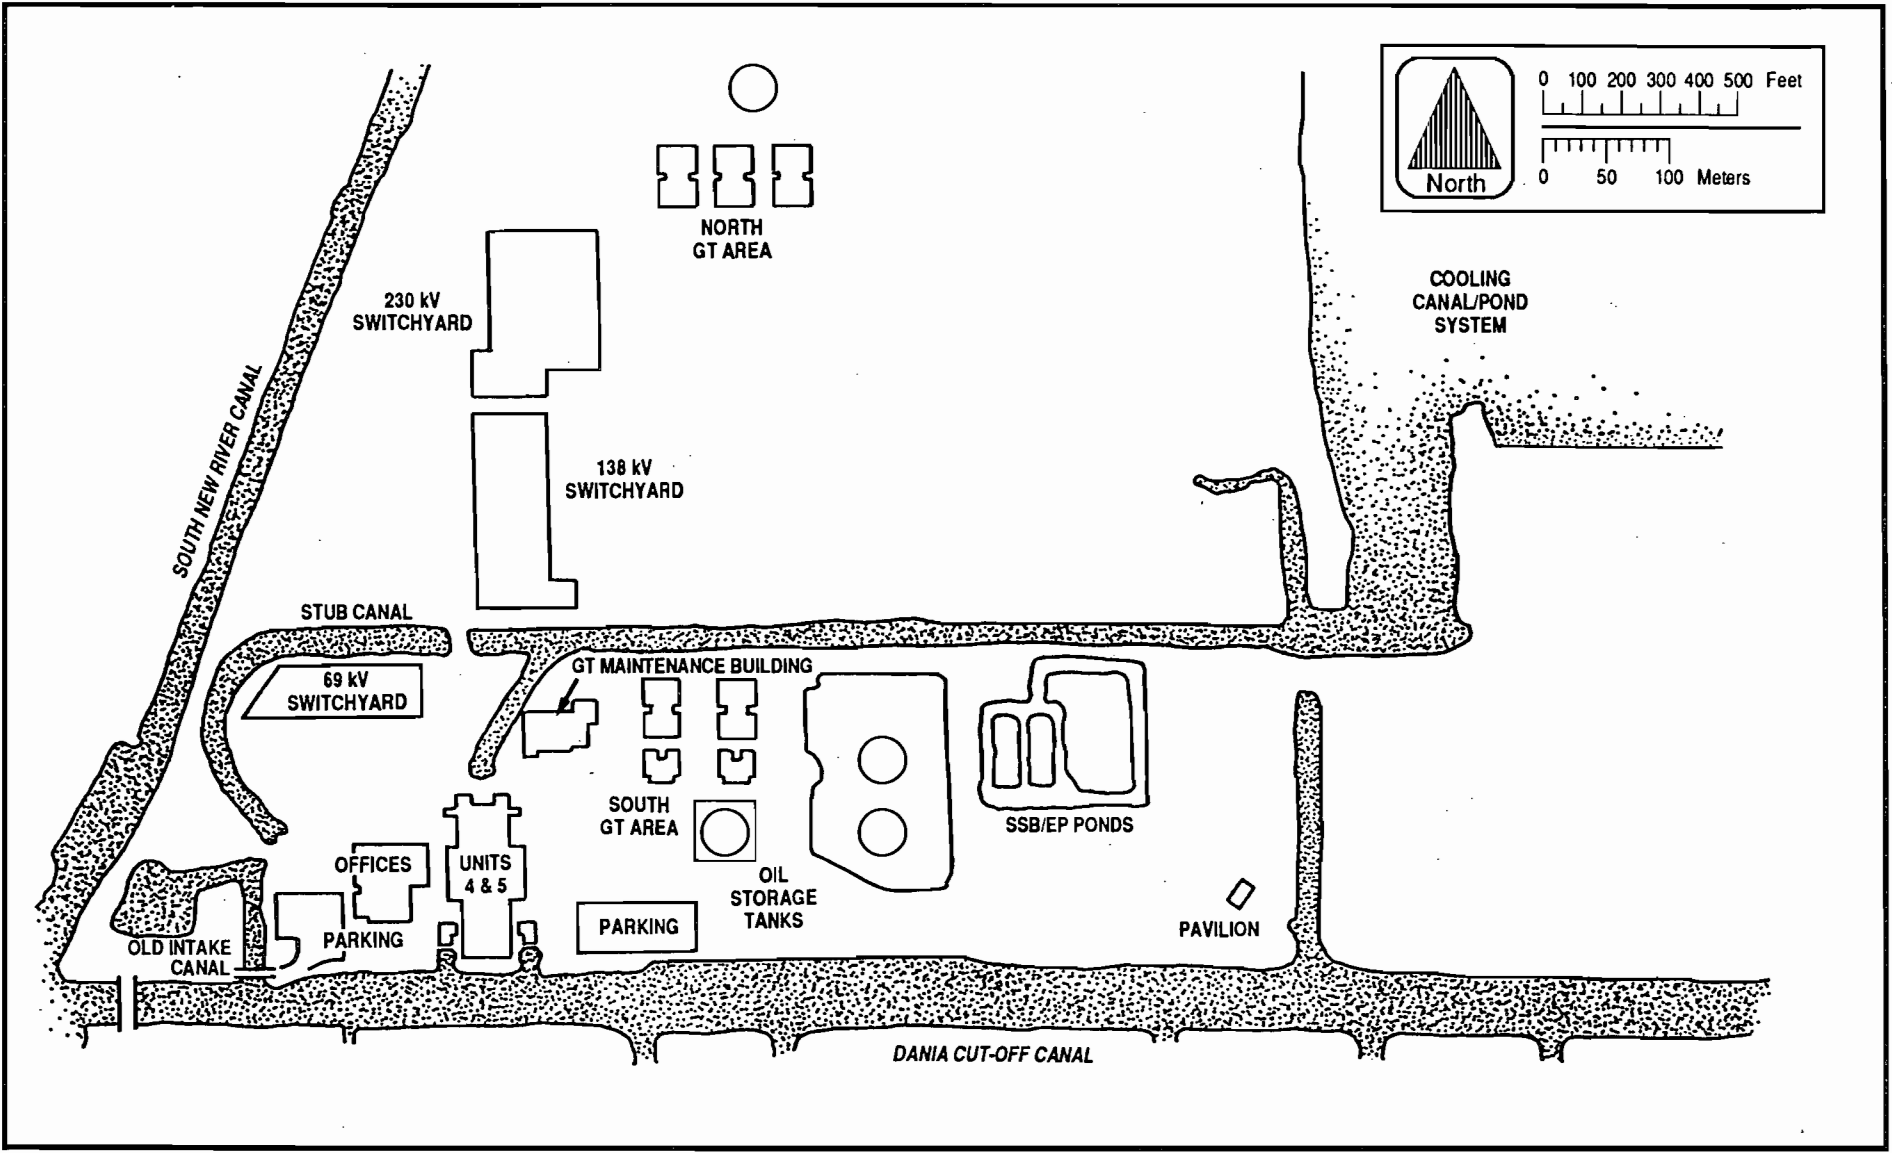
LAUDERDALE PLANT SITE — MAJOR EXISTING USES
